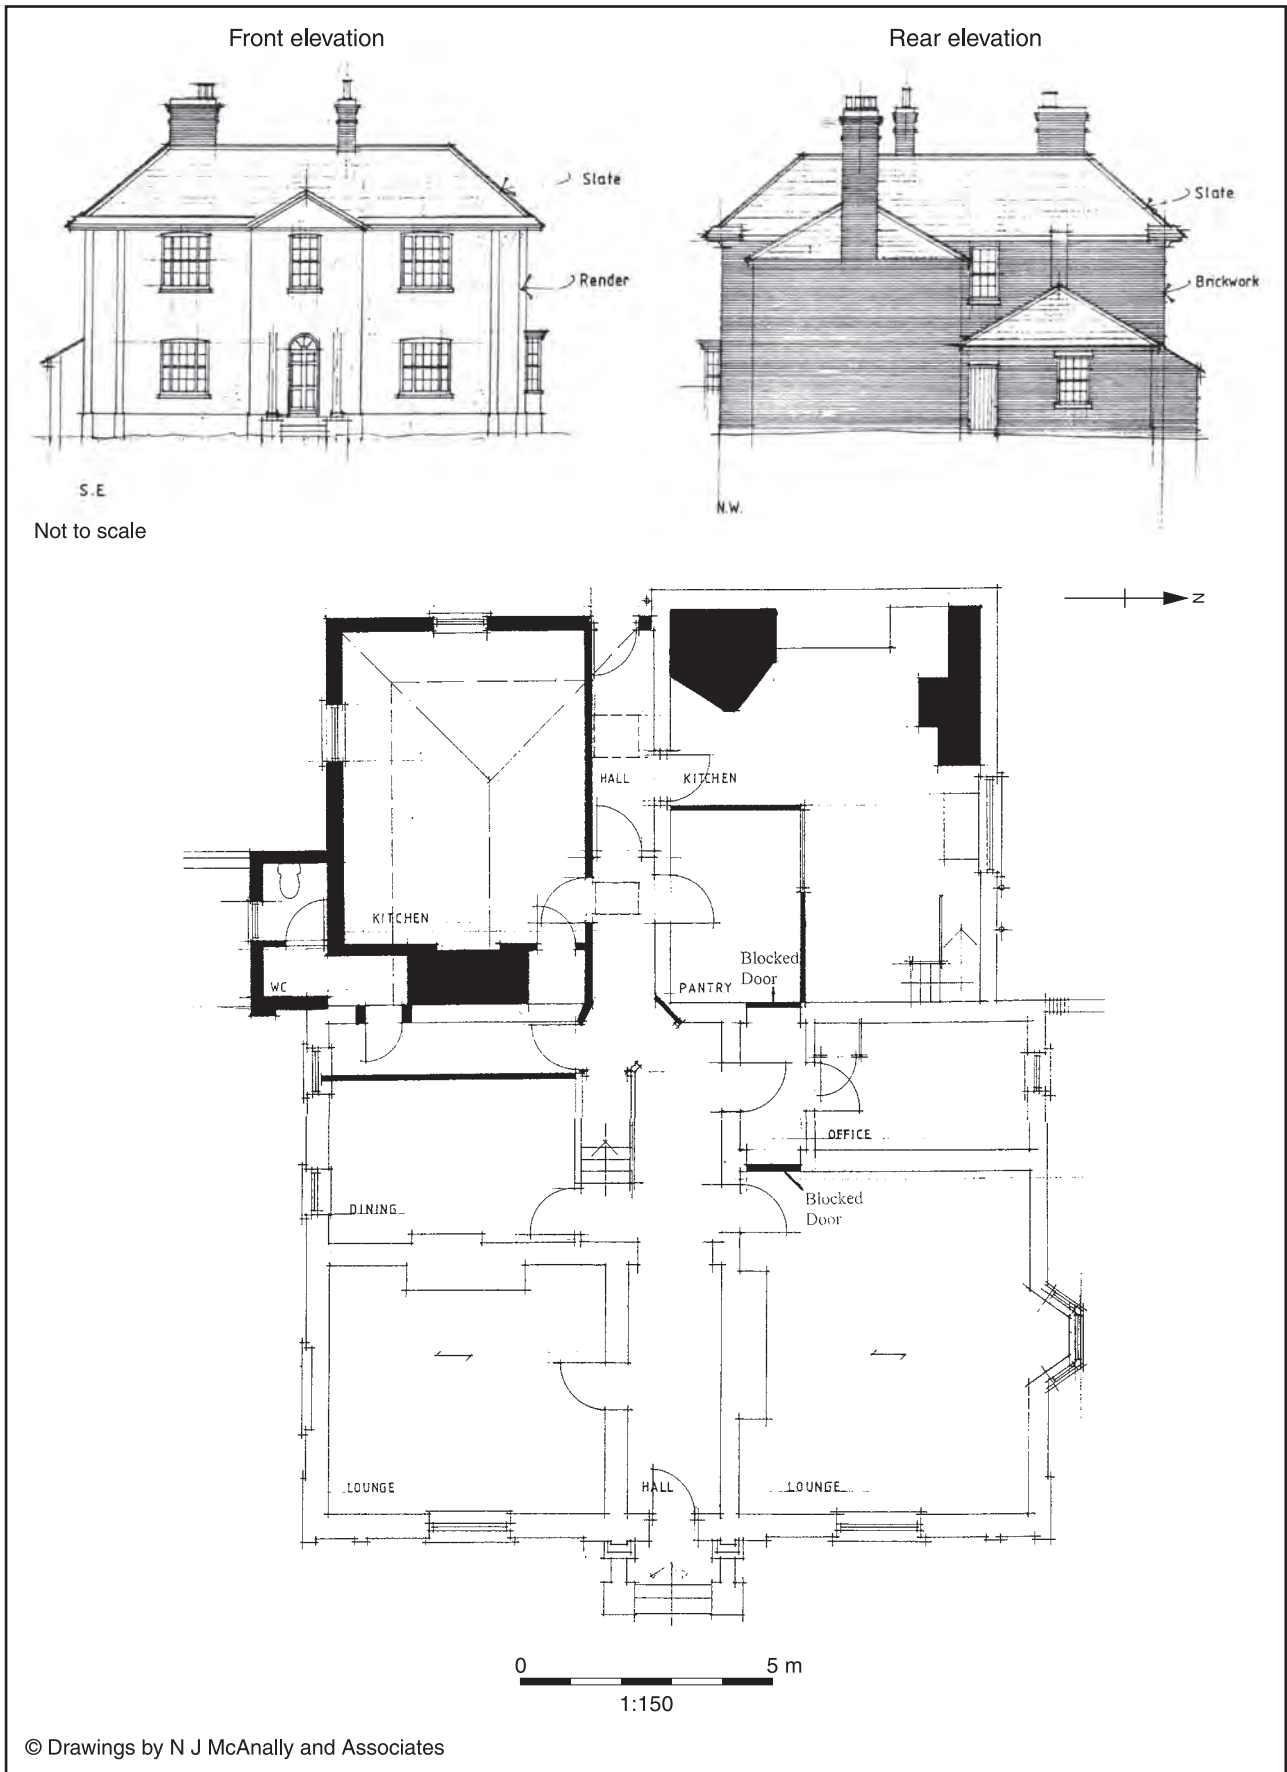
Yonsea Farm: farmhouse plan and elevations
